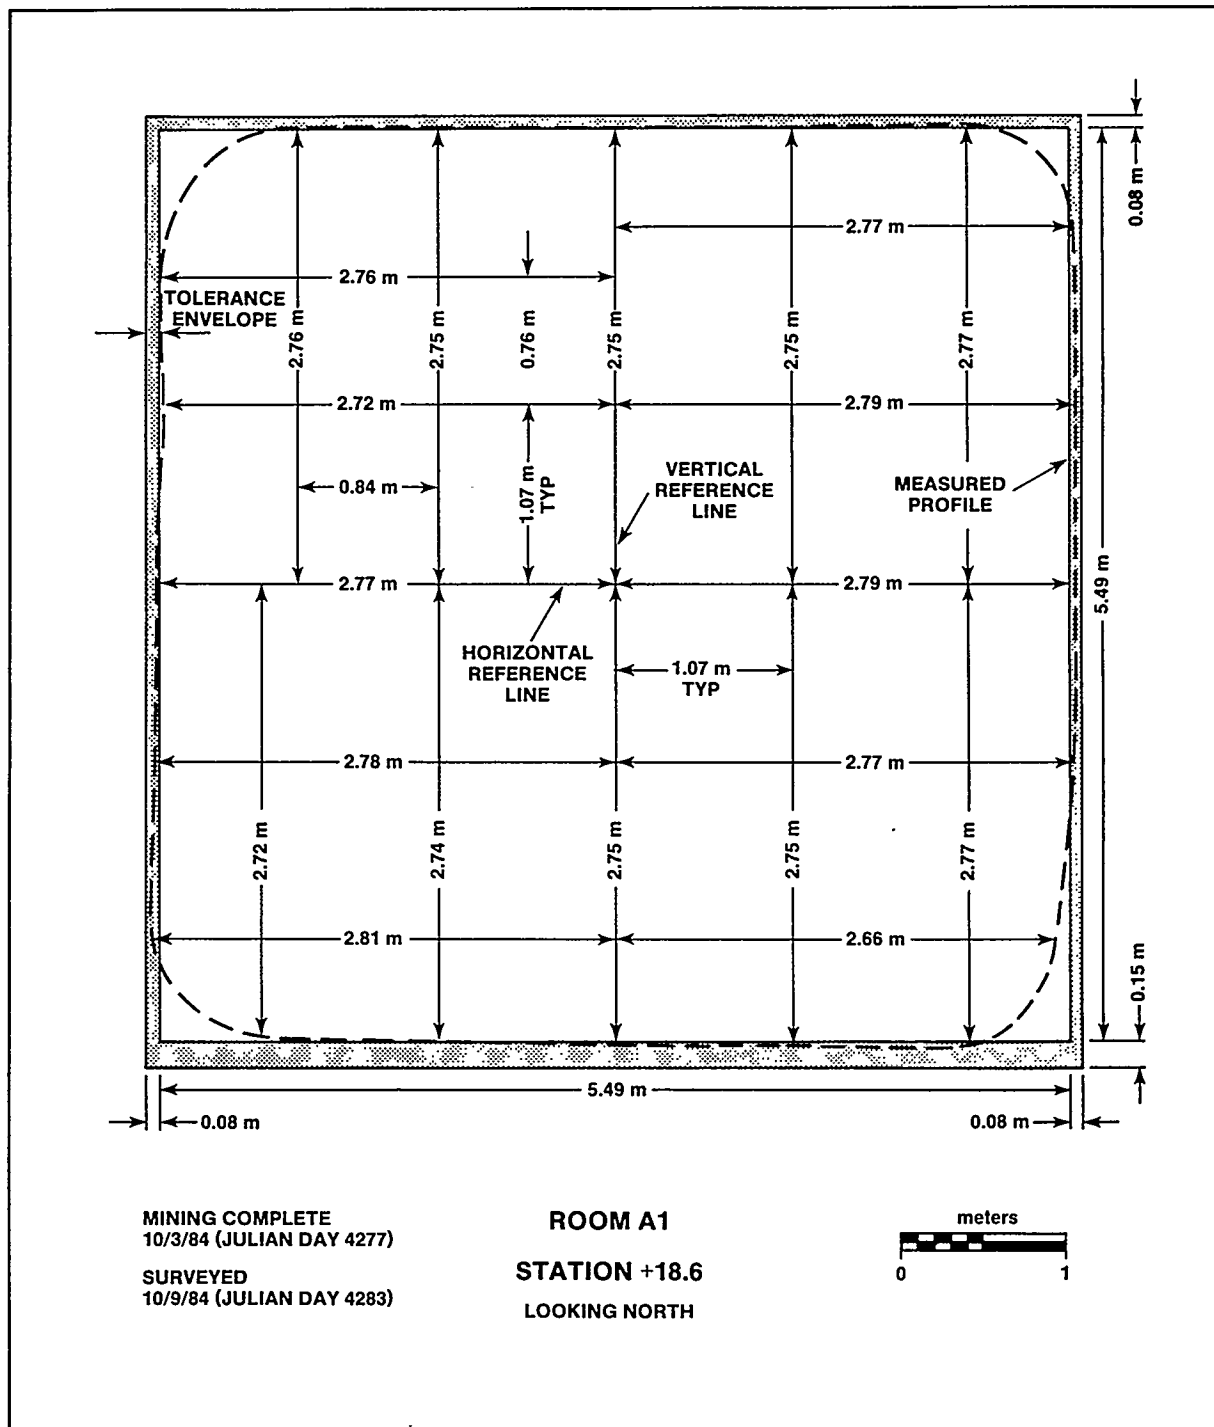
As-Built Cross Section of Station +18.6 m, Room A1
